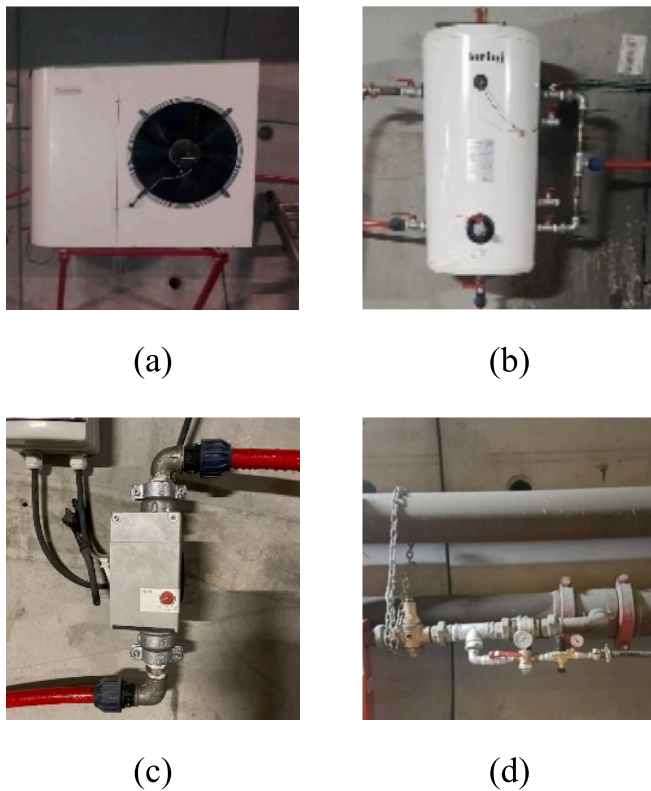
Details of Smart Flowing testing system: heat pump (a); storage tank (b); circulation pump (c); automatic fill unit (d).
